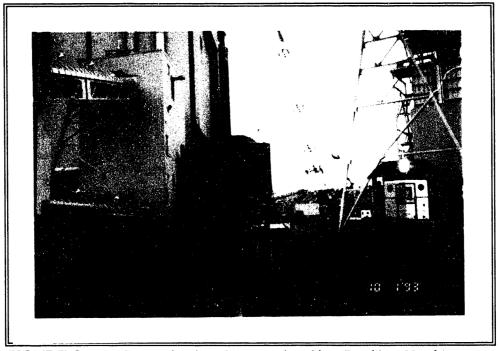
PDF Deactivation Construction Site (Looking North).
